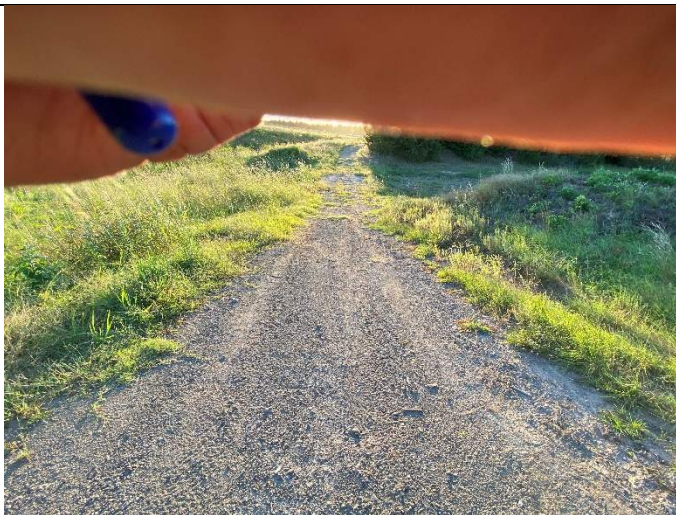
View of primary emergency spillway, looking upstream. Arrow points to overflow weir location. Note rutting at left side of photo.
